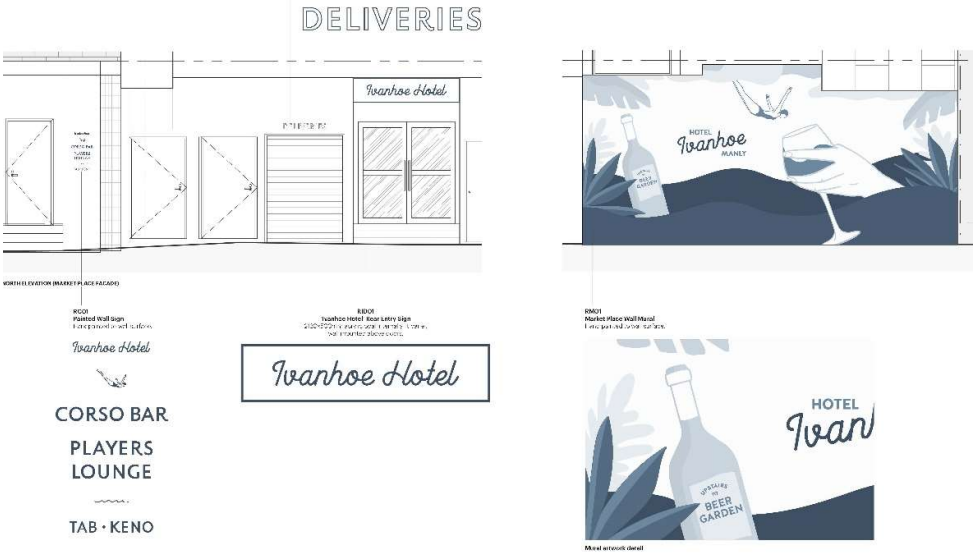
The proposed style and character of the Marketplace Wall mural.
